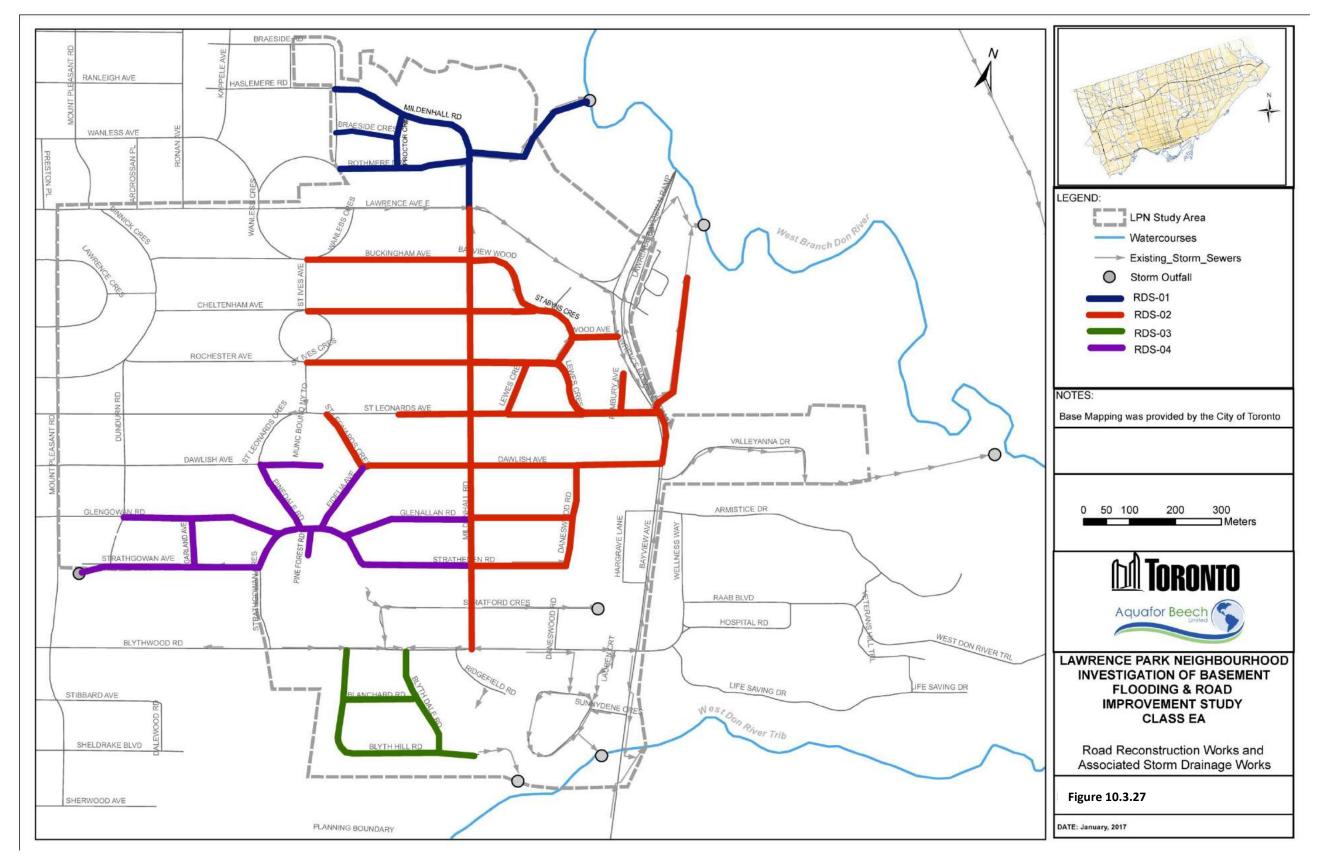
Preferred Solution: Road Reconstruction Works and Associated Storm Drainage Works
